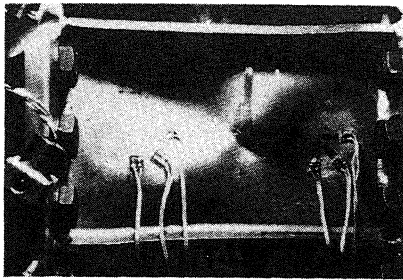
DAMAGED LINKS (SPECIMEN 2)
